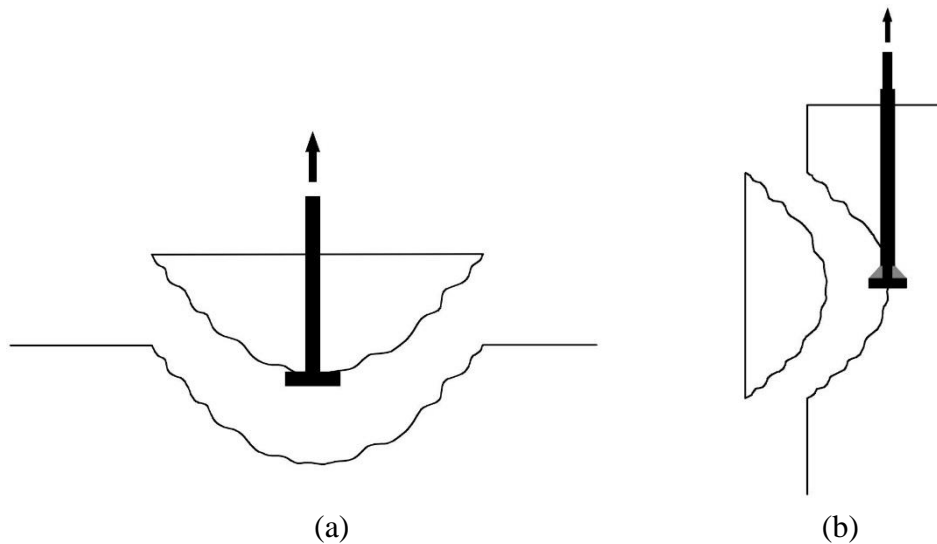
Pullout and side-blowout failure modes (a) pullout failure, (b) side-blowout failure [figure after DeVries (1996)]
